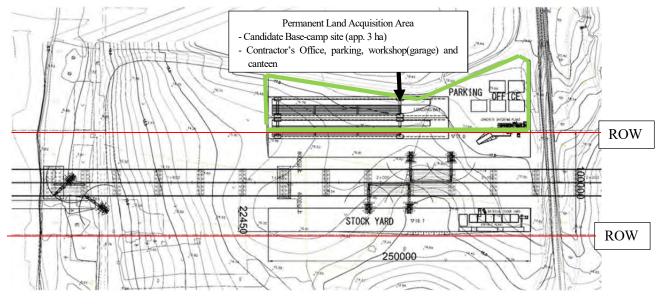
Layout of Construction Yards for New Sittaung Bridge (Reference only)
